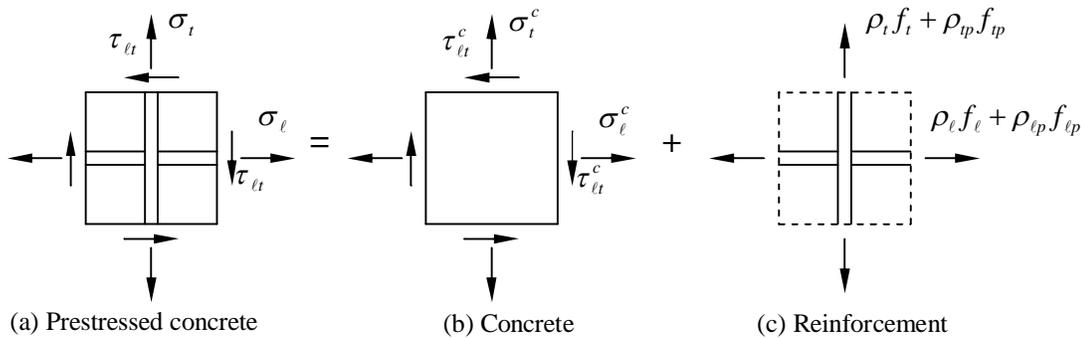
Coordinate System in a Prestressed Concrete Membrane Element
